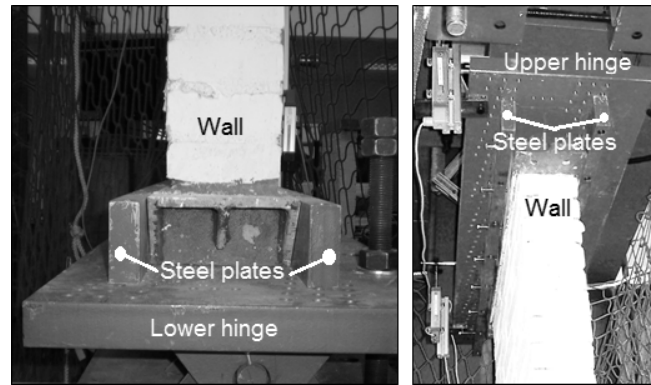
Detail of the connection between the wall and the test system at the lower end (left) and the upper end (right)
